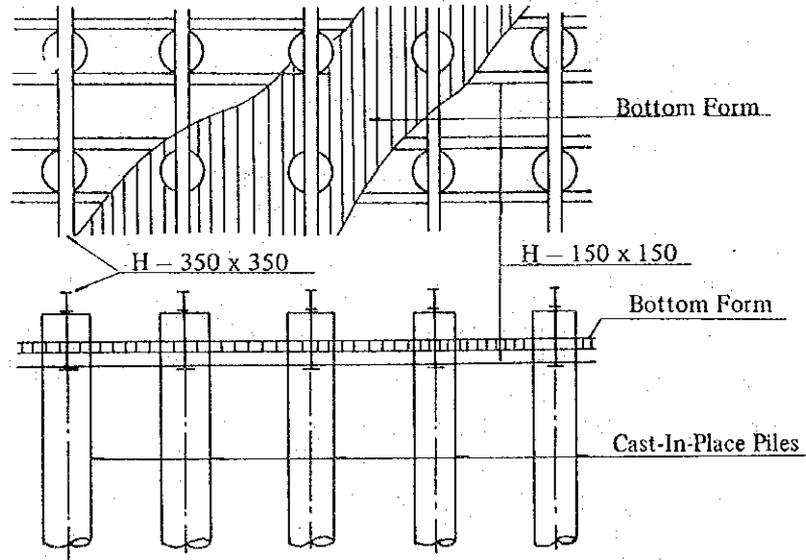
BOTTOM SCAFFOLDING FOR FOOTING
